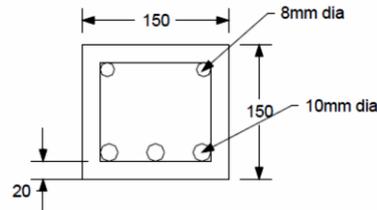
Cross Sectional Details of Flexure and Shear Beams (Size: 150mm x 150mm)
